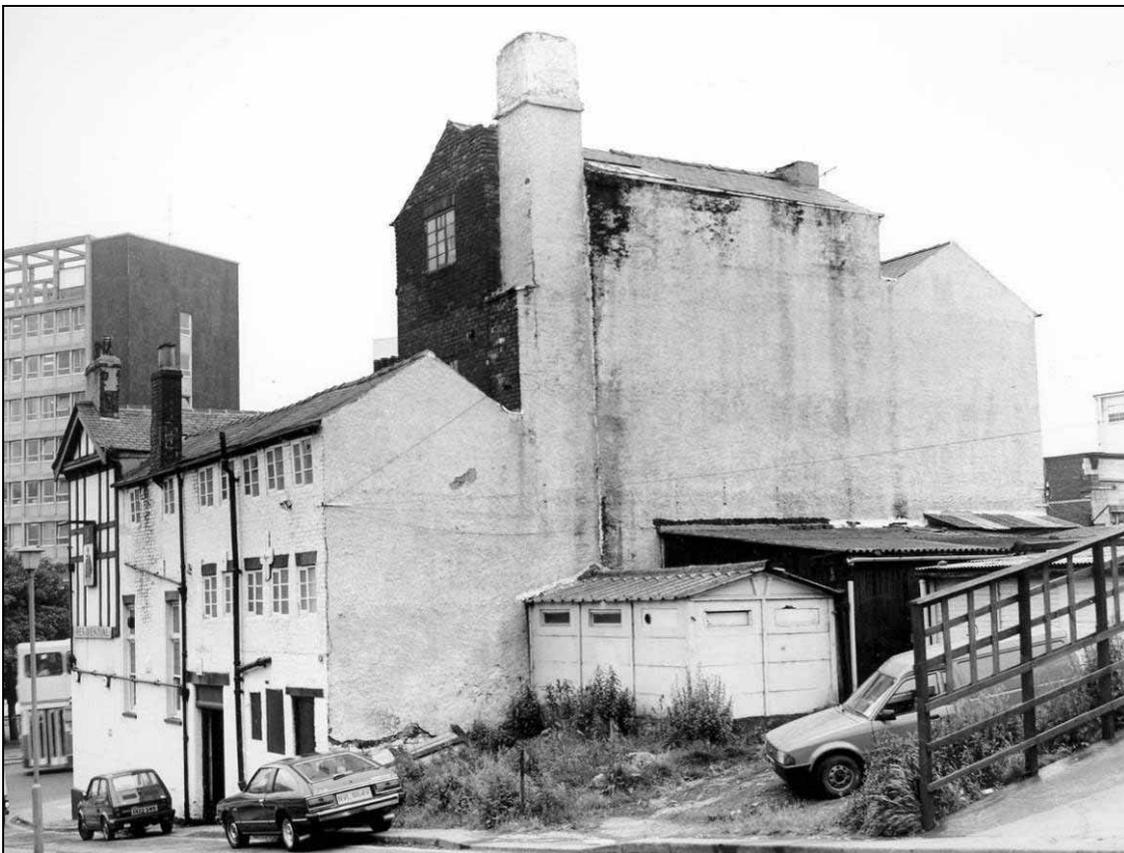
Front and side elevation of Building F photographed in 1988 (copyright Sheffield City Council)
